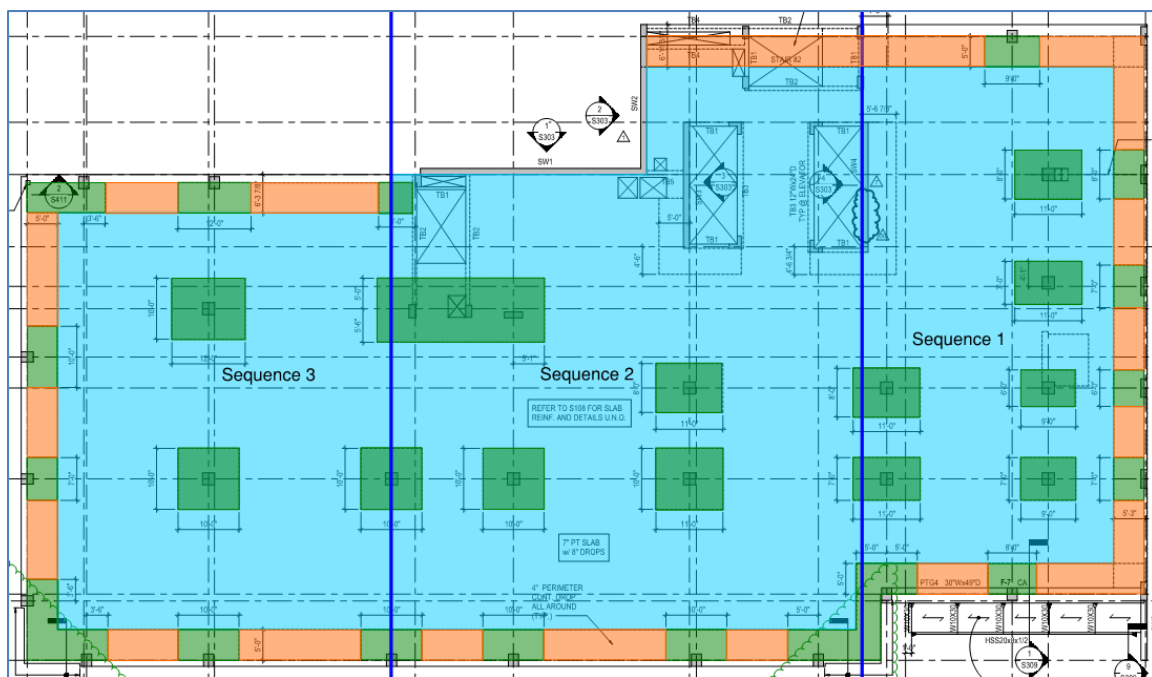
Typical Cast-in-Place Concrete Pour Sequence
